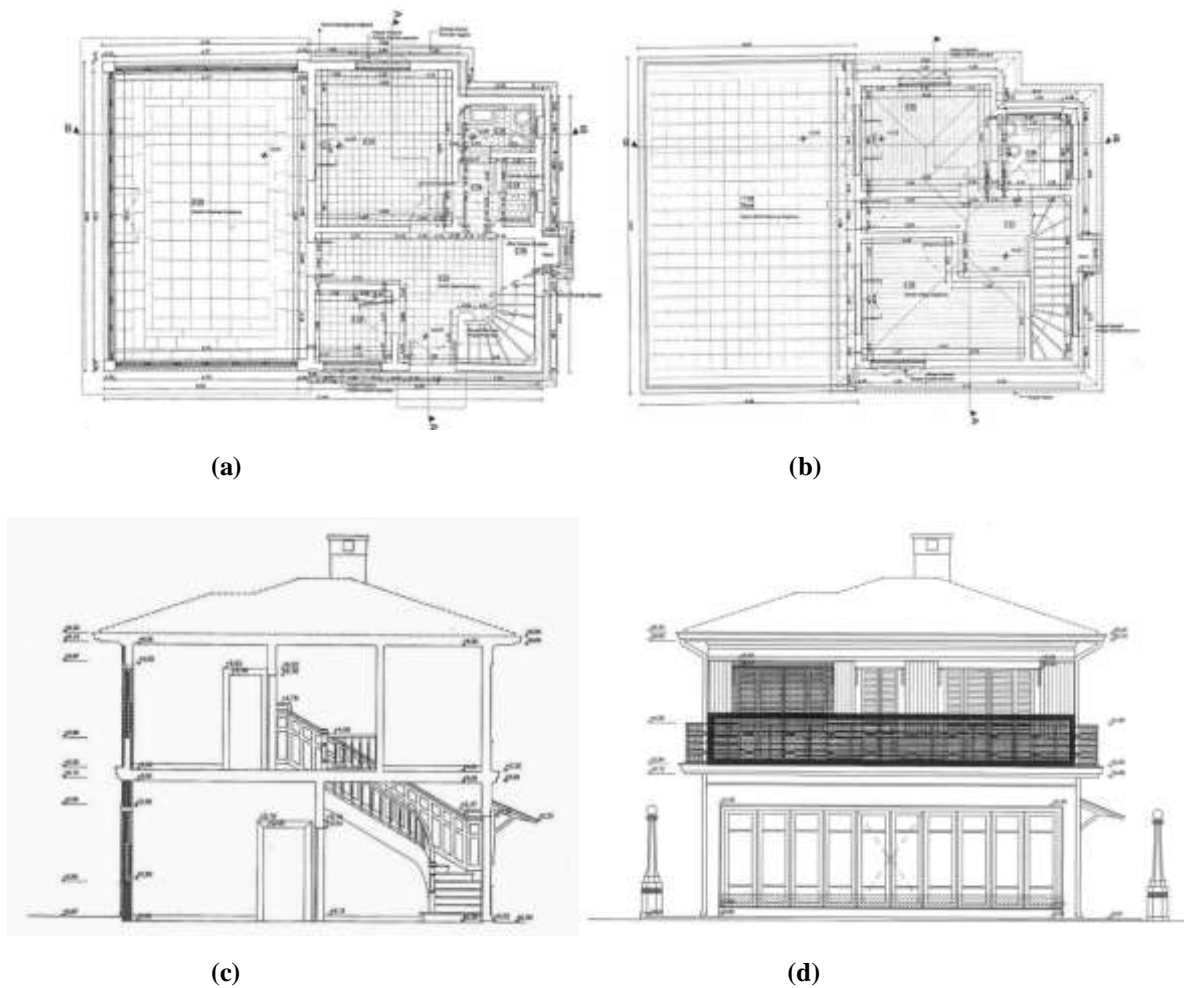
Architectural drawings of Atatürk Mansion: Ground floor plan (a), 1st floor plan (b), section A-A (c) and north view (d) (URL 5)
